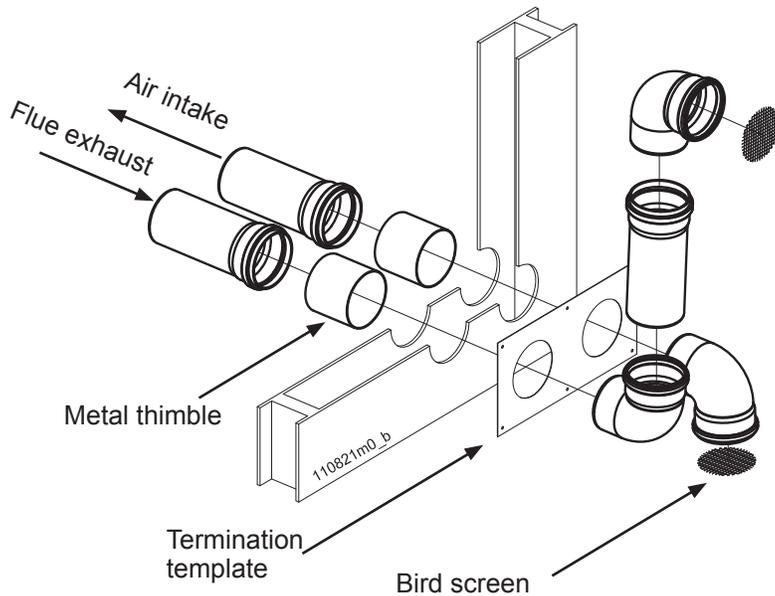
Two pipes sidewall termination of air and vent (if space permits)
